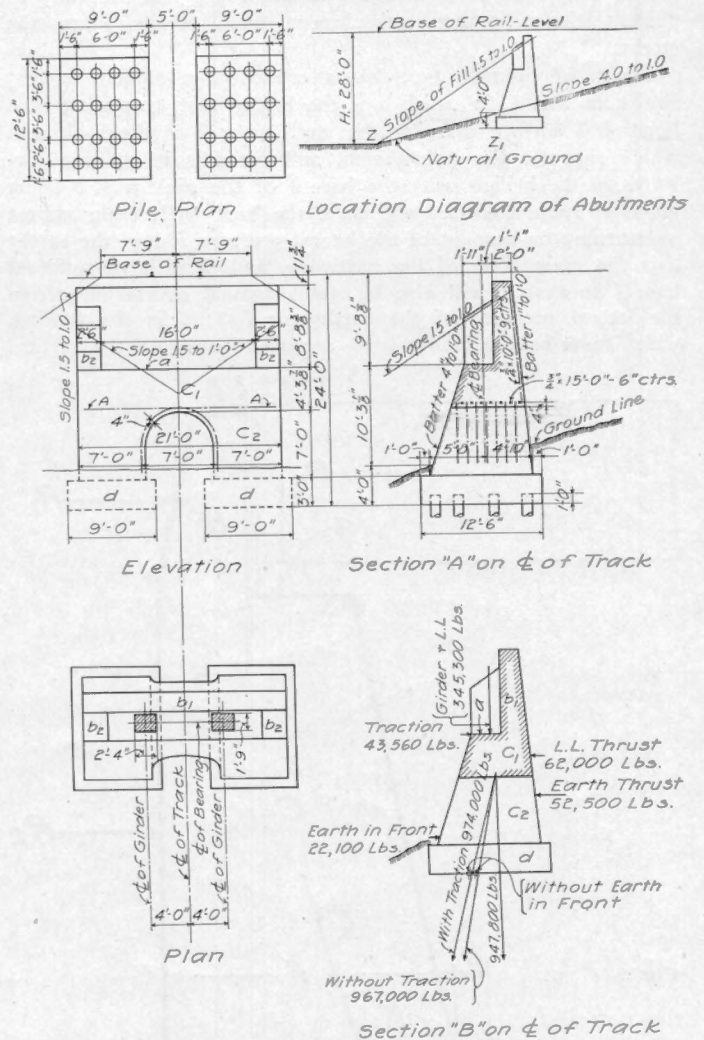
Type B₂, Plain Concrete Pier Abutment.
